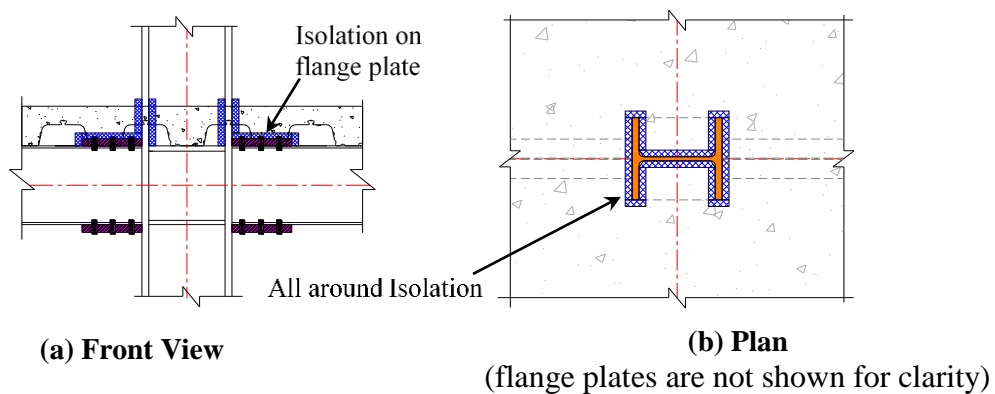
Bolted Flange Plate Connection – Slab Isolation Details
